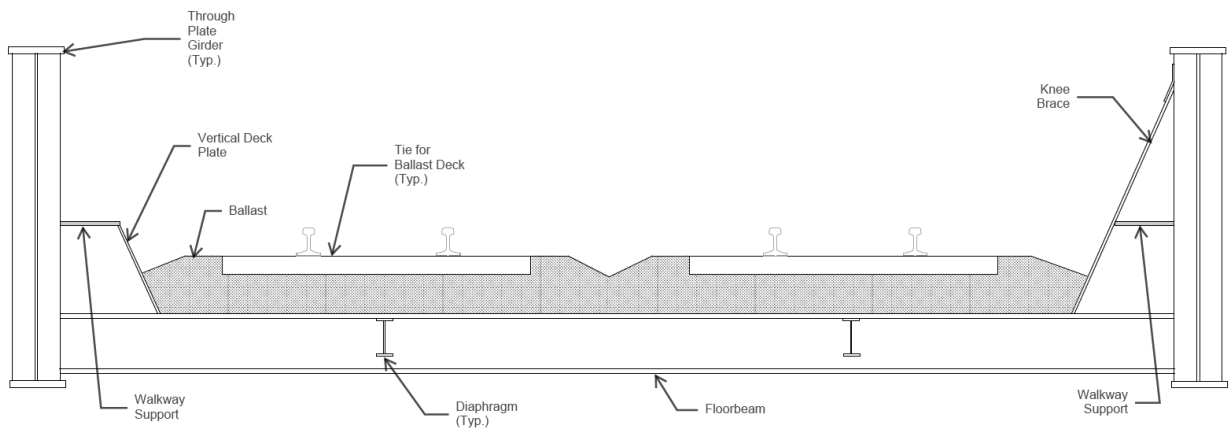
(c) – Double Track Through-girder Bridge without Shared Center Girder
